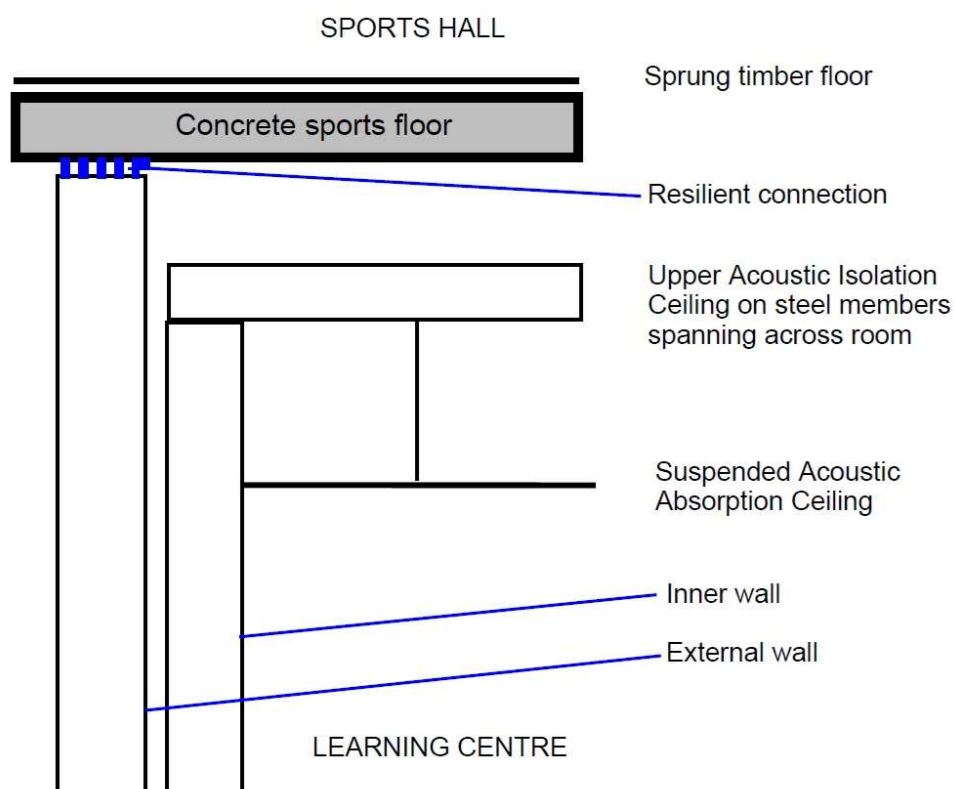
Typical section through isolated ceiling and walls under sports hall floor
